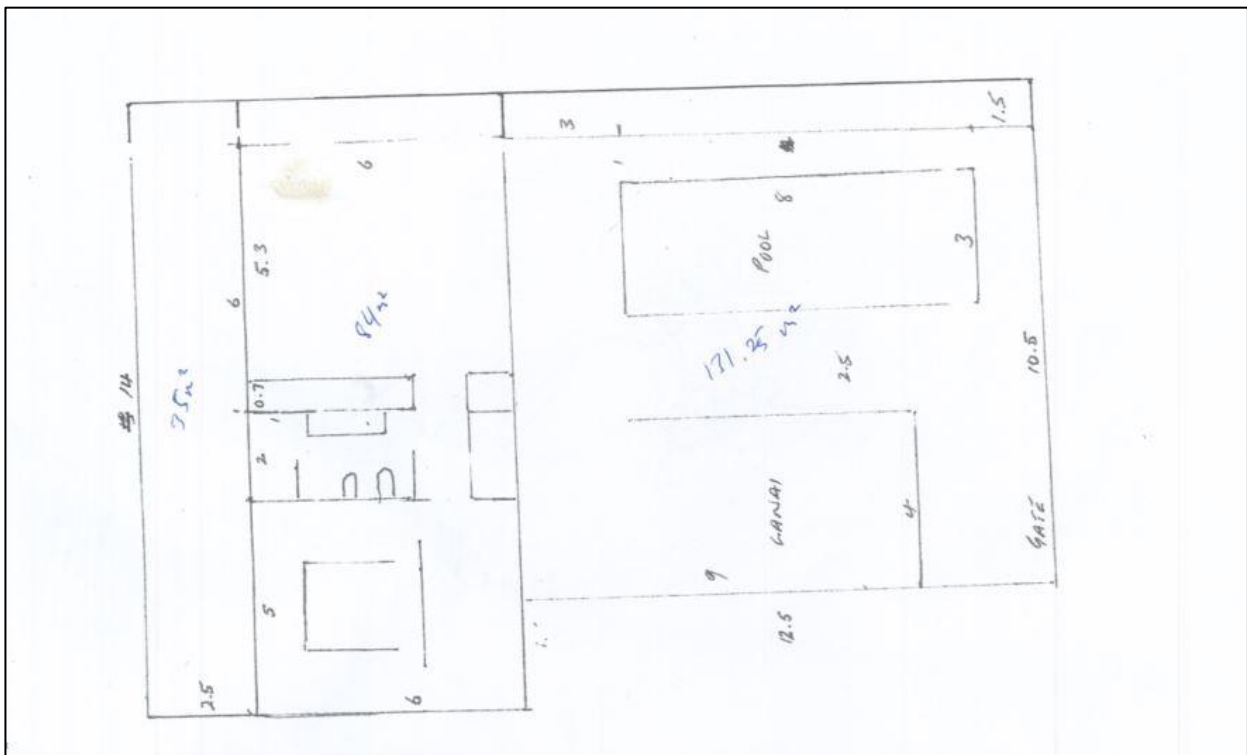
Screenshot of the Draft Floor Plan Provided by Client.
